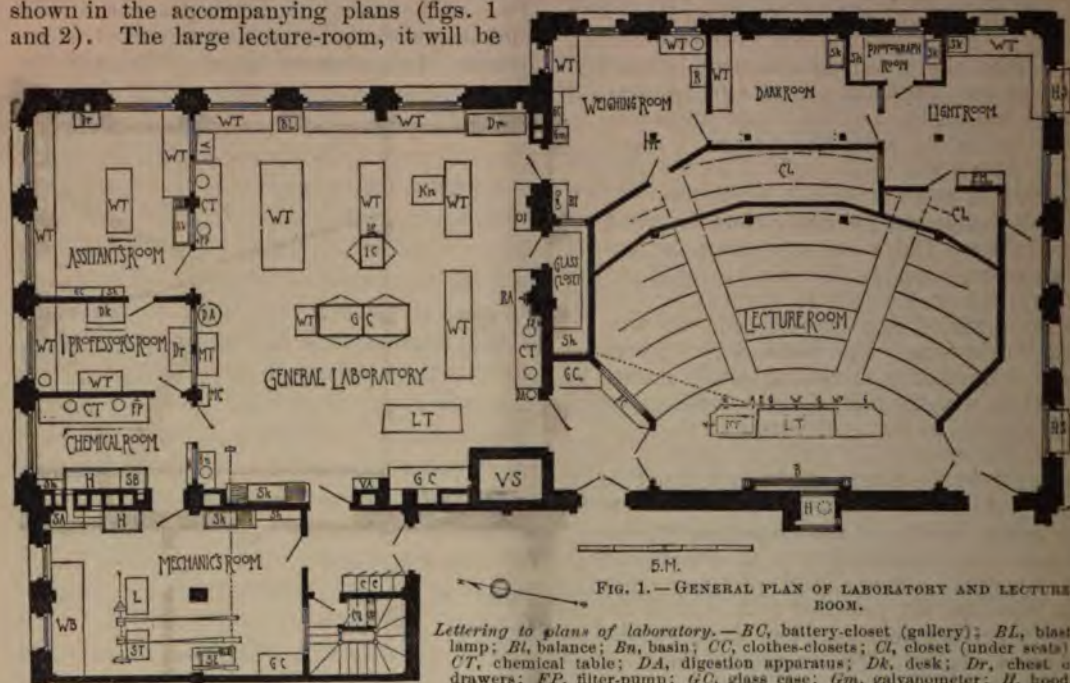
GENERAL PLAN OF LABORATORY AND LECTURE-ROOM.
